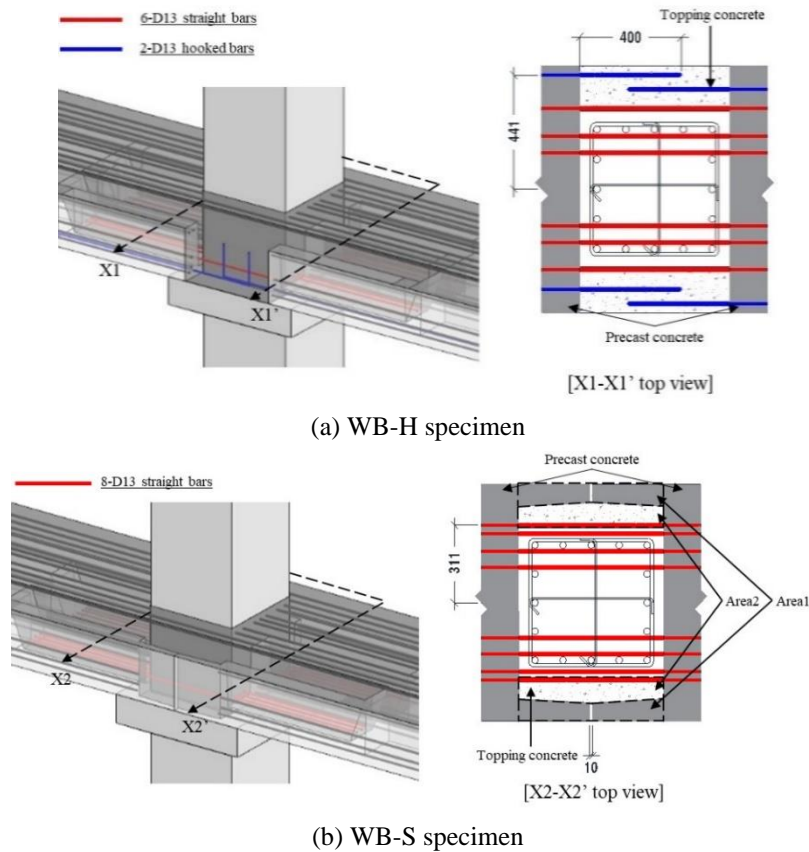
Longitudinal reinforced details at the interior joint (unit: mm)
